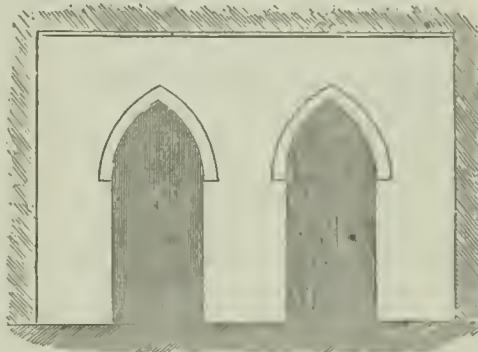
The Shakespeare tunnel, on the South-Eastern Railway.
